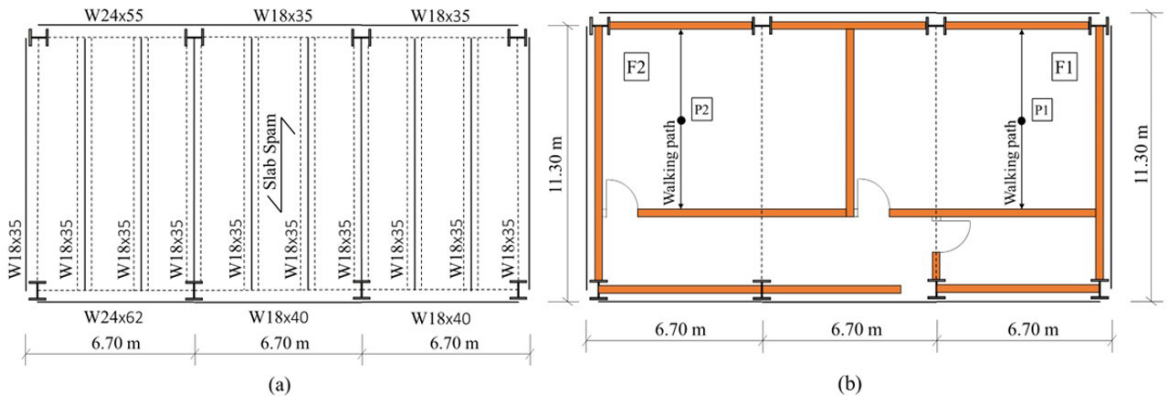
Third floor structural plan (a) and architectural plan, with walking test information (b).
